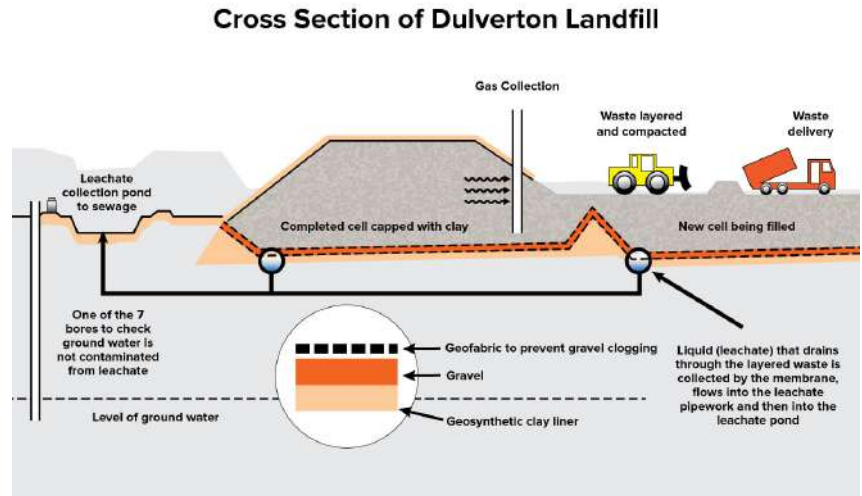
Cross Section of a Landfill. Diagram by @Dulverton Waste Management
